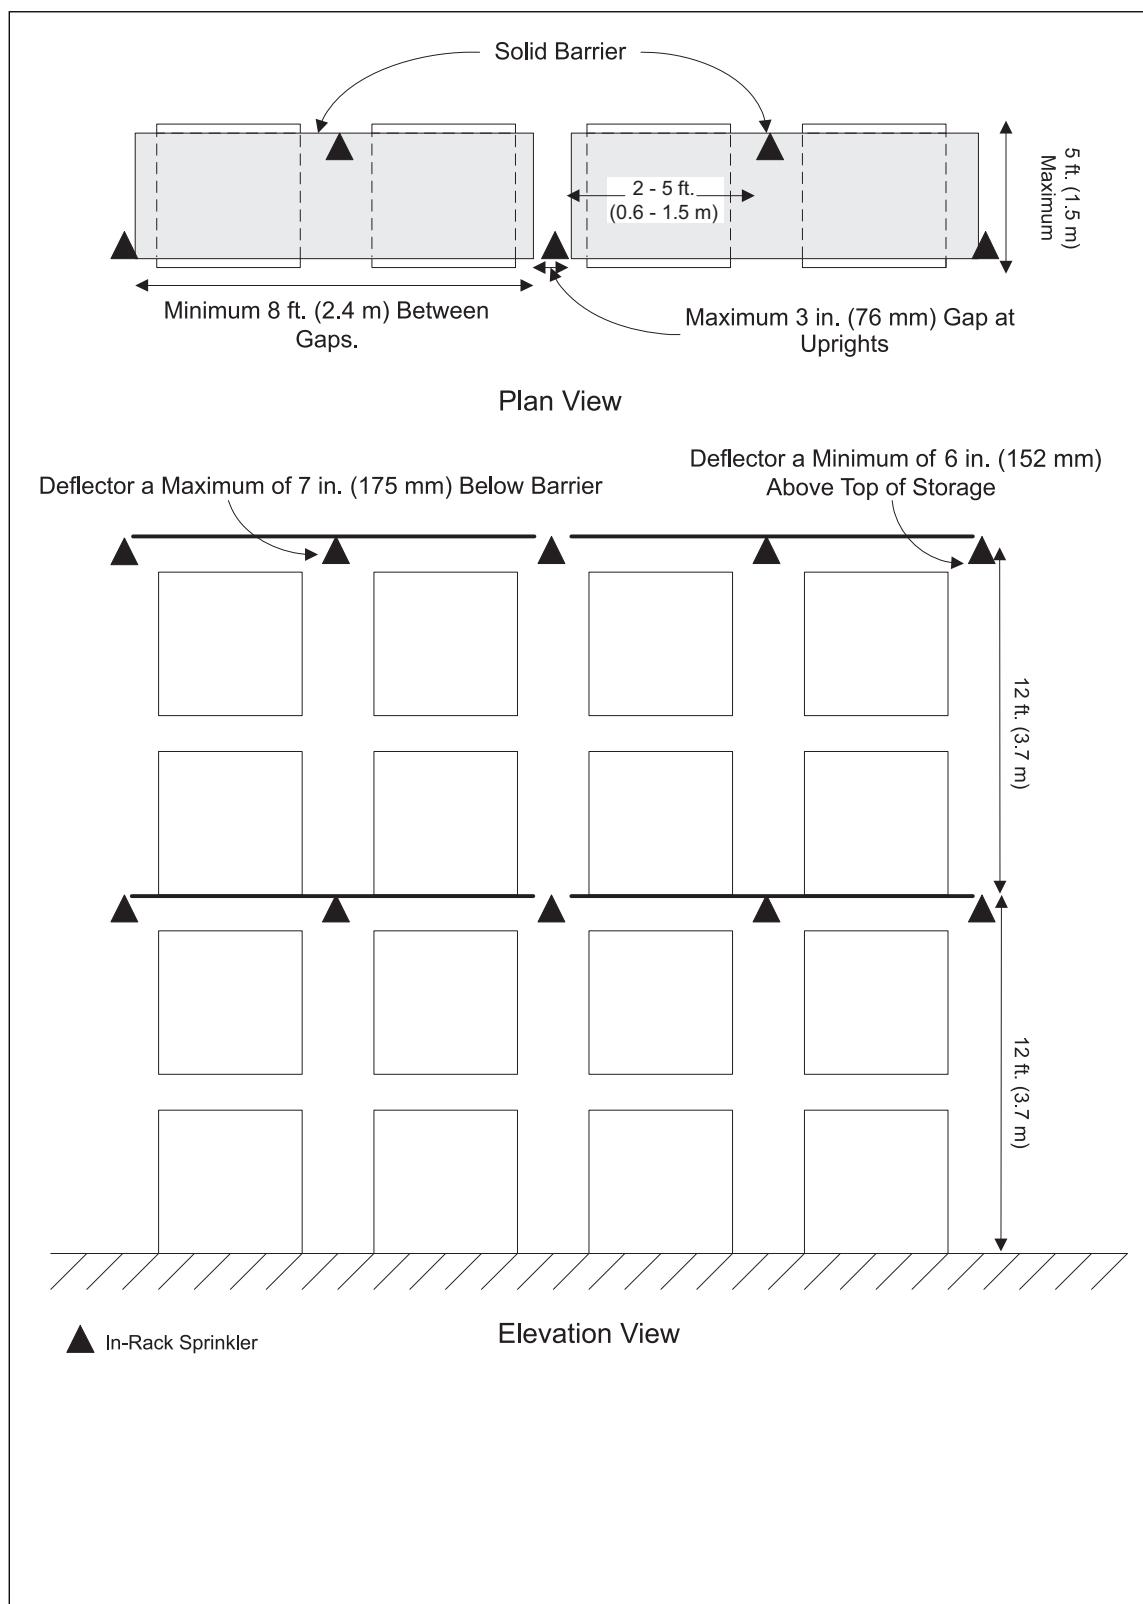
Single-row rack sprinkler layout: fire protection scheme A
